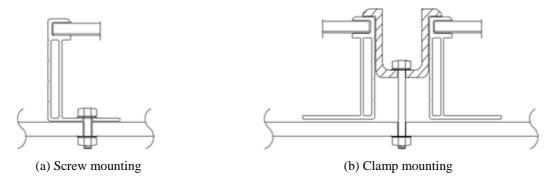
The module installed with (a) screw mounting, (b) clamp mounting
